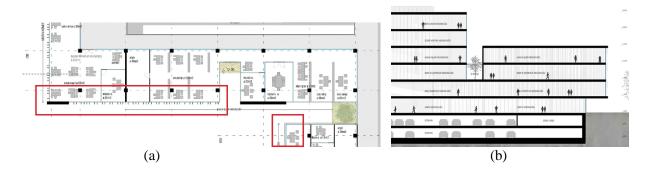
Efeler Town Hall (a) Ground storey glass partition walls, (b) Partial section
